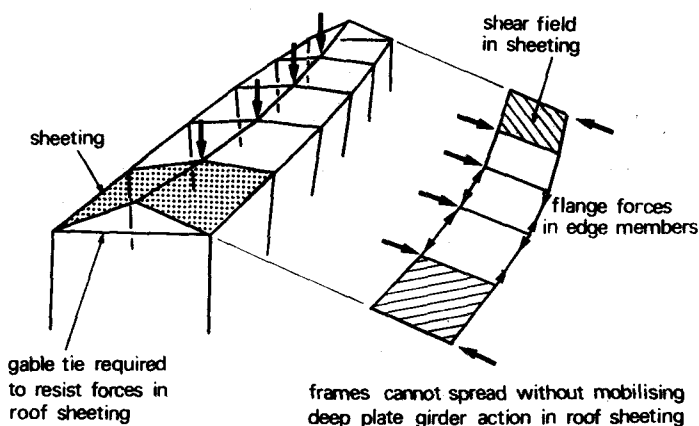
Stressed skin action in a pitched roof portal frame structure carrying vertical load.
